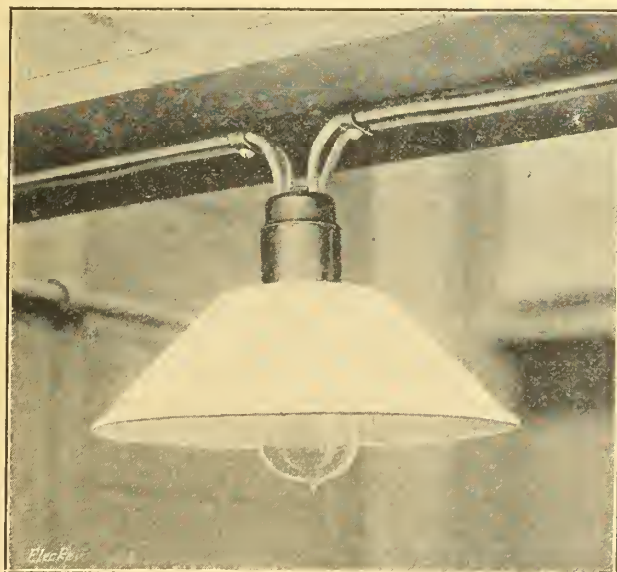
CORROSION-PROOF FITTING COMPLETE.
